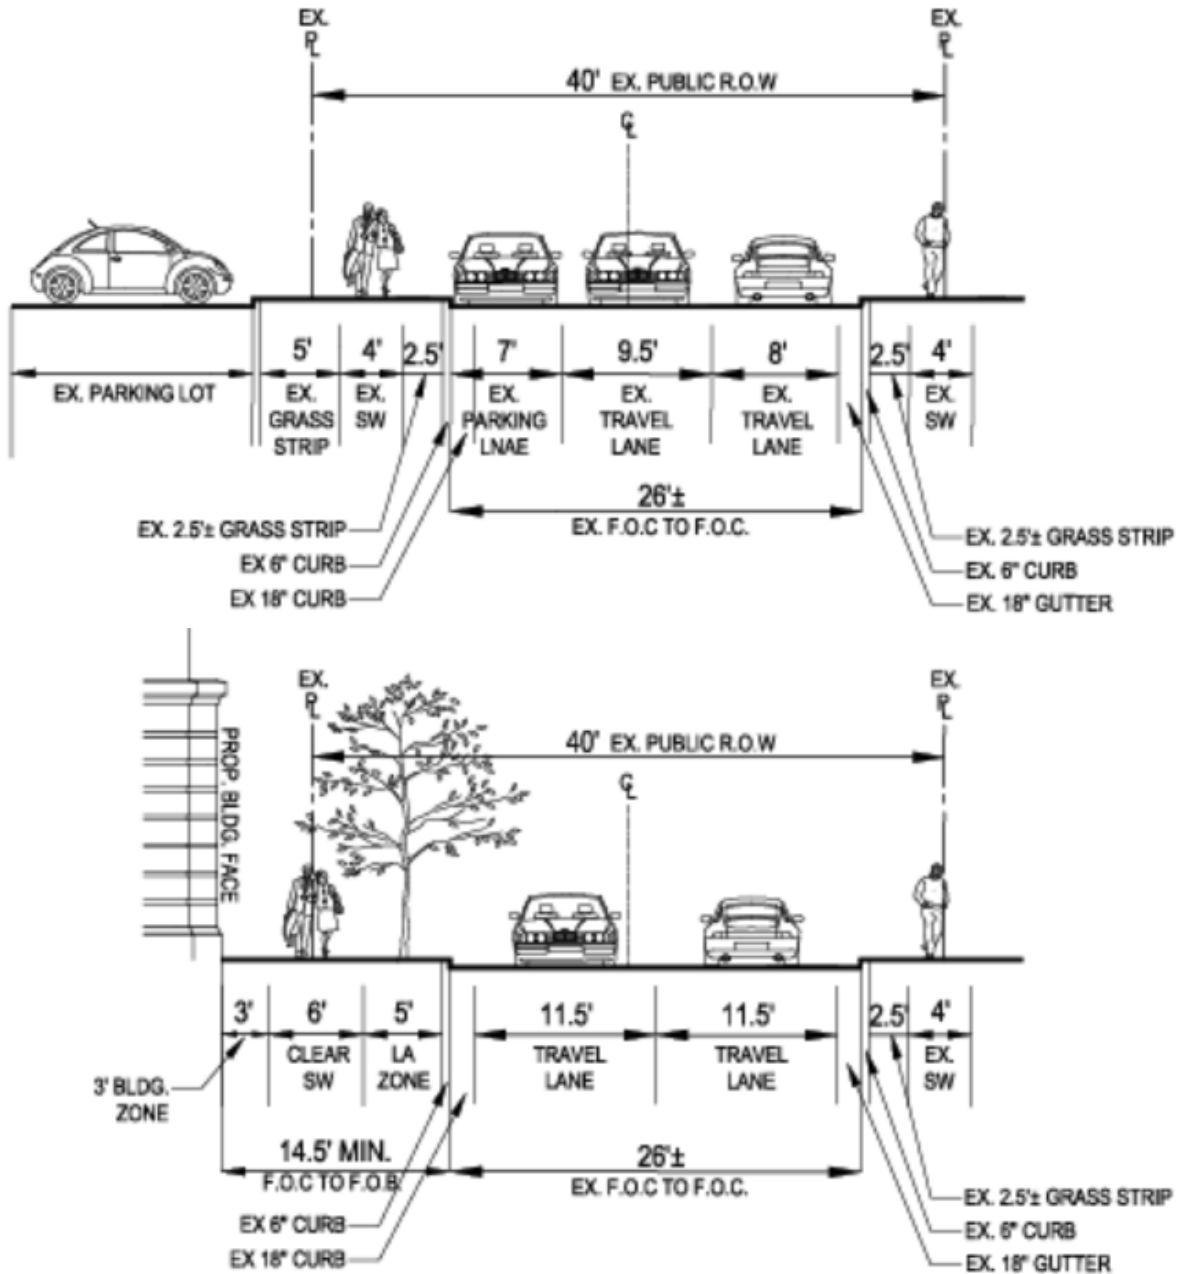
Existing (top) and Proposed (bottom) Fairfax Drive Cross-section
